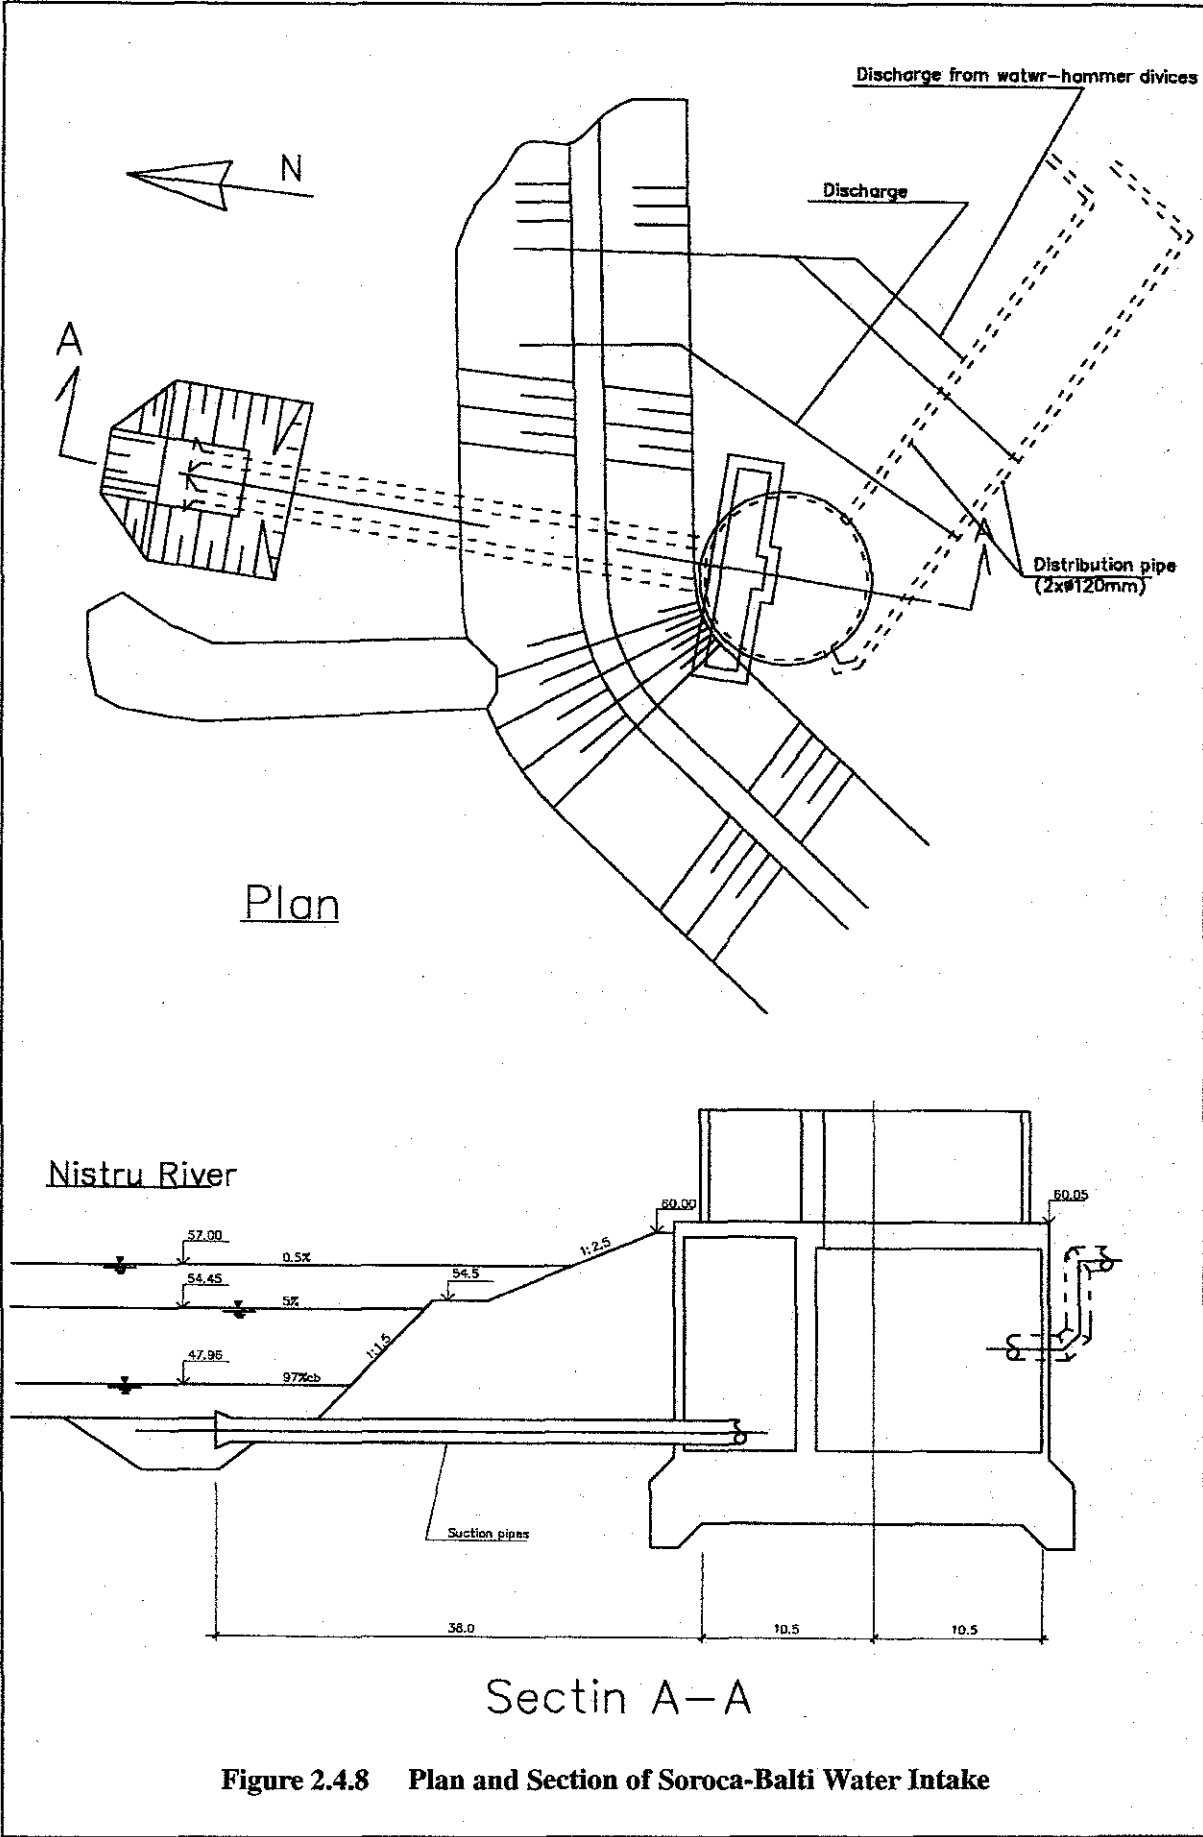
Plan and Section of Soroca-Balti Water Intake
